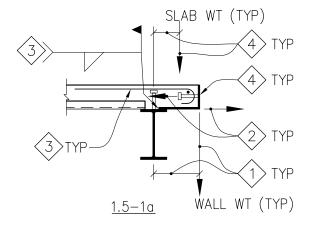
STRUCTURAL STEEL CONSTRUCTION ISSUES - ROOF
